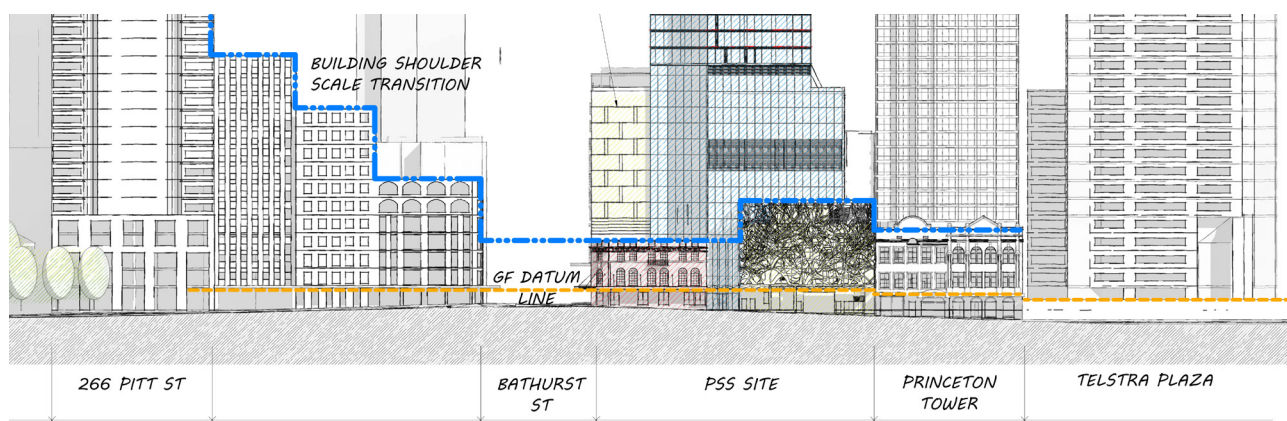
Indicative Street Wall Response - Pitt Street Elevation
